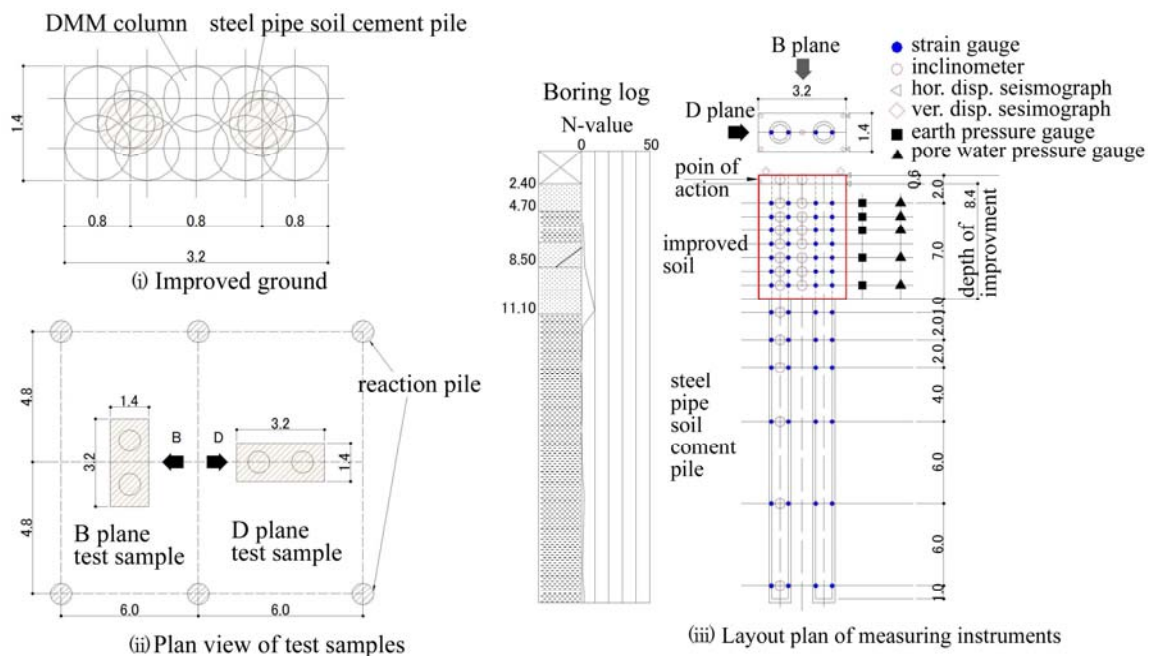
ARRANGEMENT OF TEST SAMPLES
